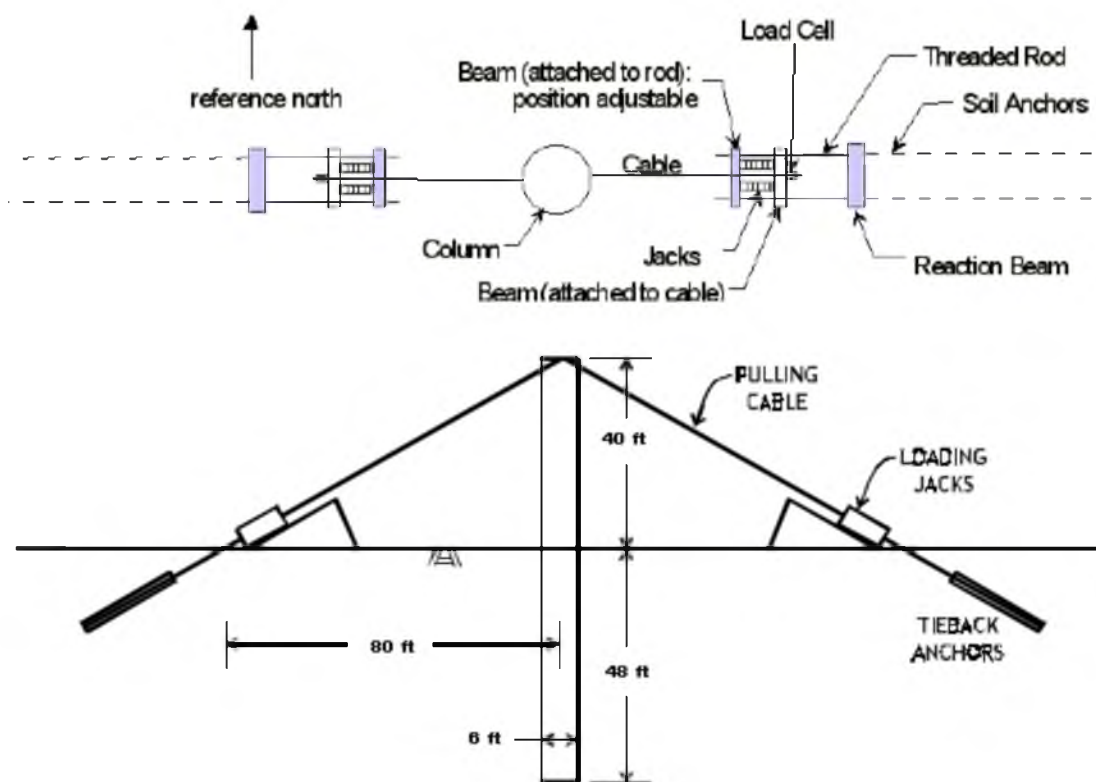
Schematic of loading system for DS 75-1 (Janoyan, Stewart, & Wallace, 2001)
